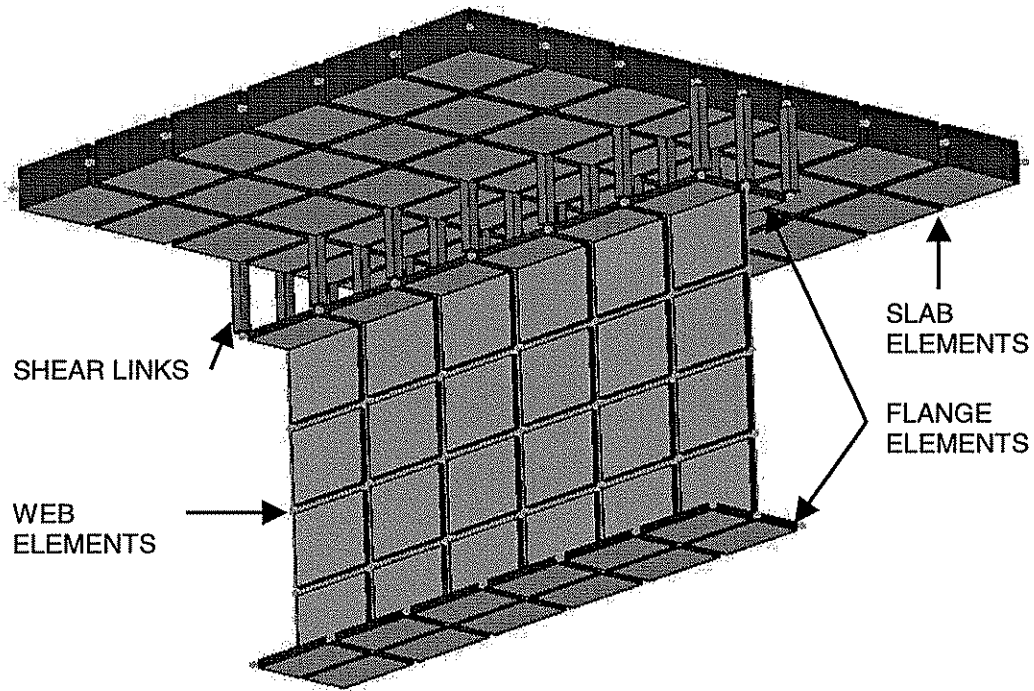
View of shear link elements attaching flange elements to slab elements.
